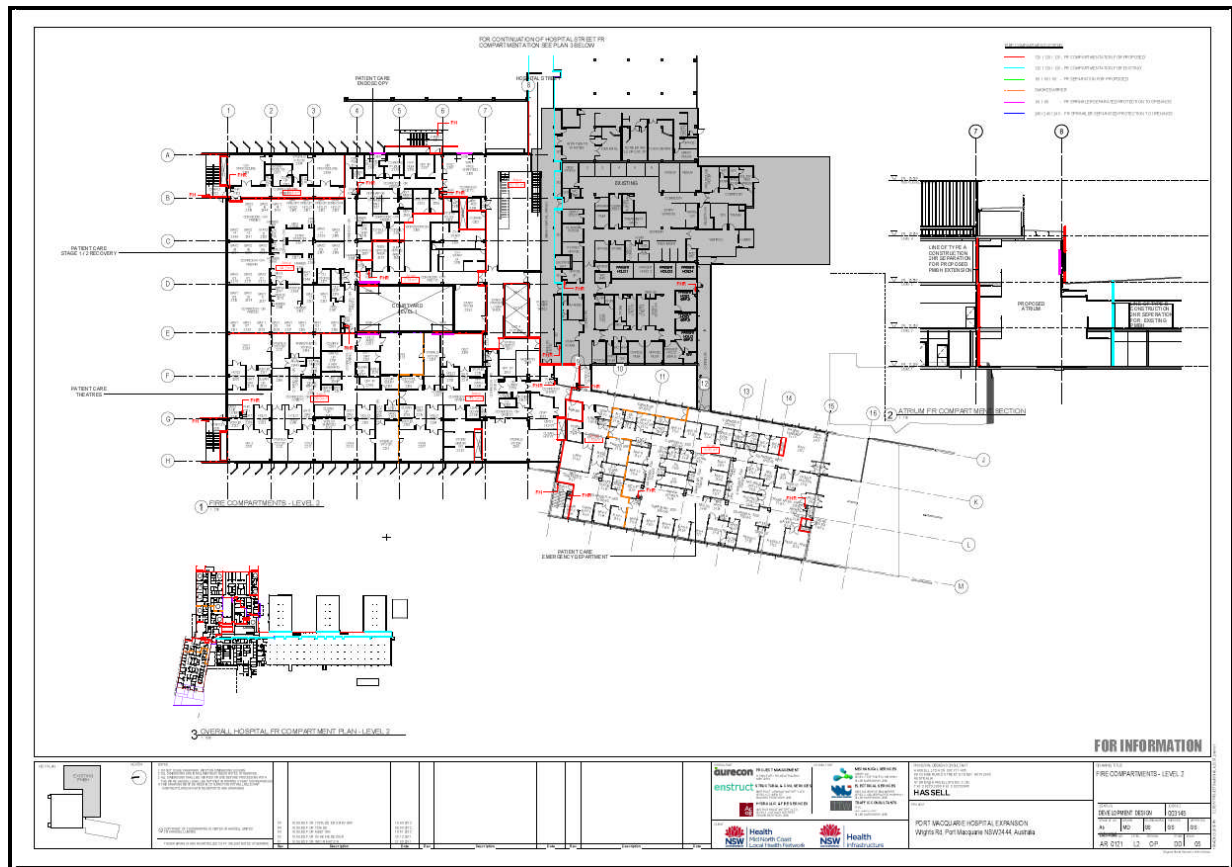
Second Level floor plan showing fire and smoke compartments and external required exits.
